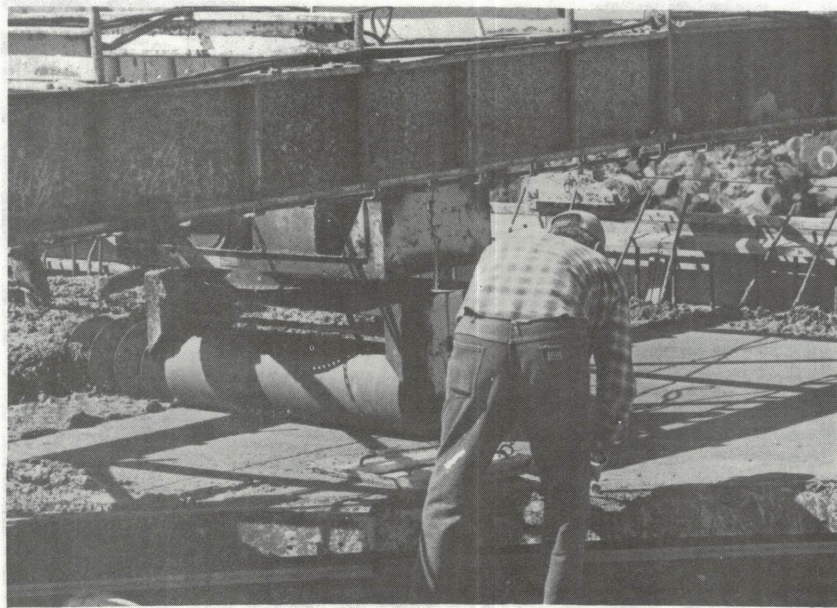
Concrete finish was done with a roller plus some additional handfinishing.
